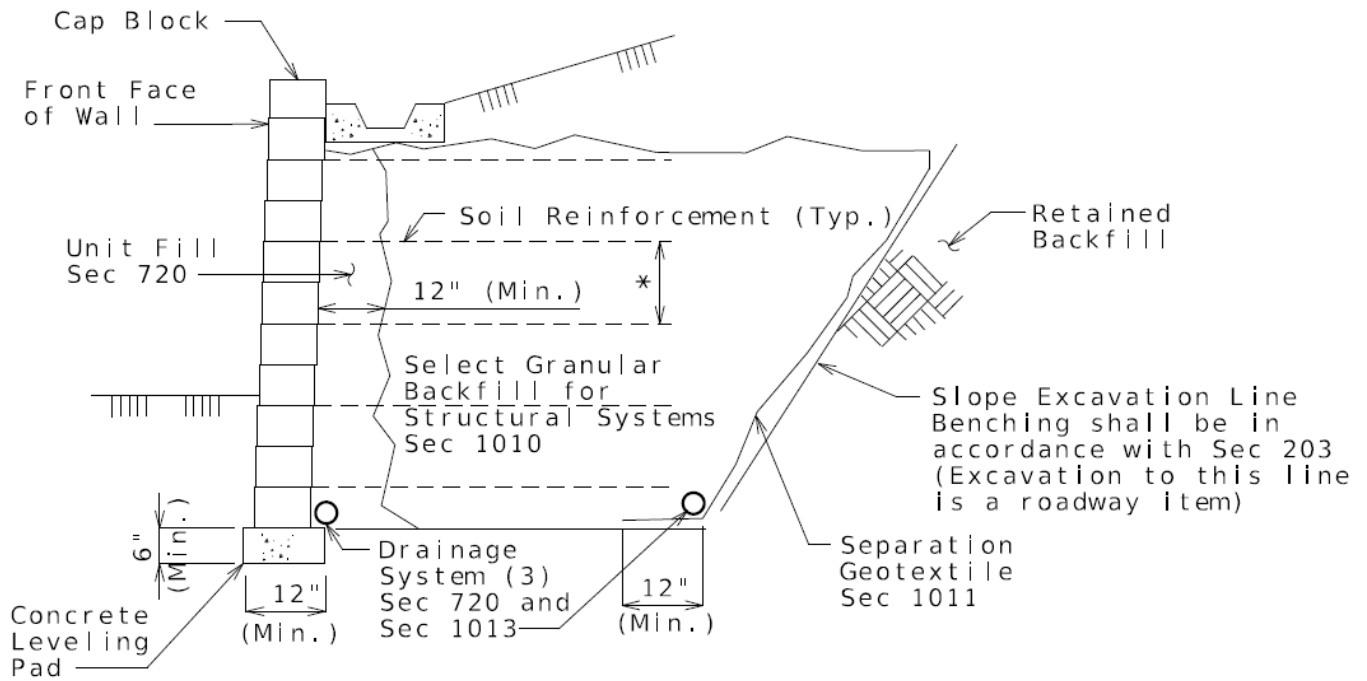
Typical Section Through Generic Drycast Modular Block Wall (DMBW-MSE) System or Wetcast Modular Block Wall (WMBW-MSE) System Small Block Wall
